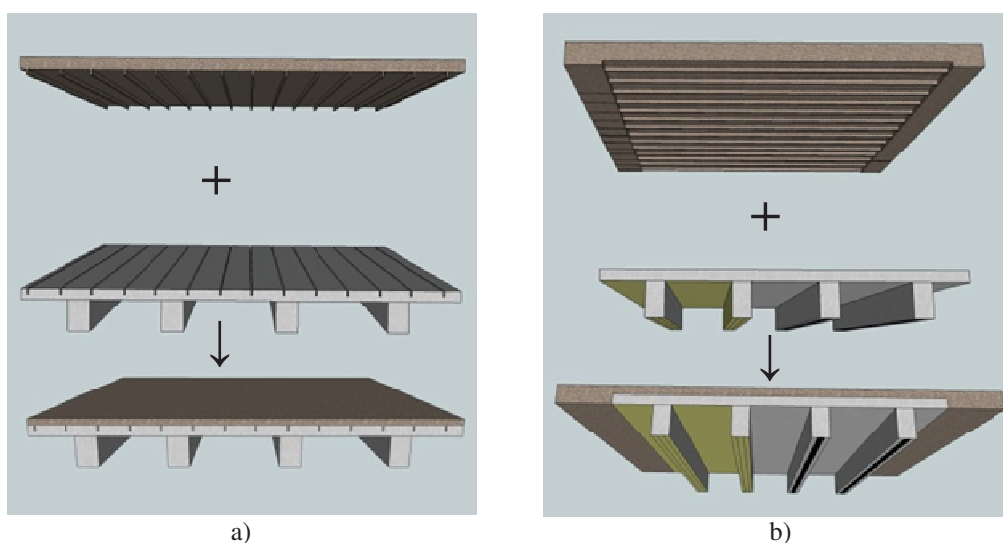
a) Refurbishment and b) Refurbishment and widening of an existing bridge deck.
